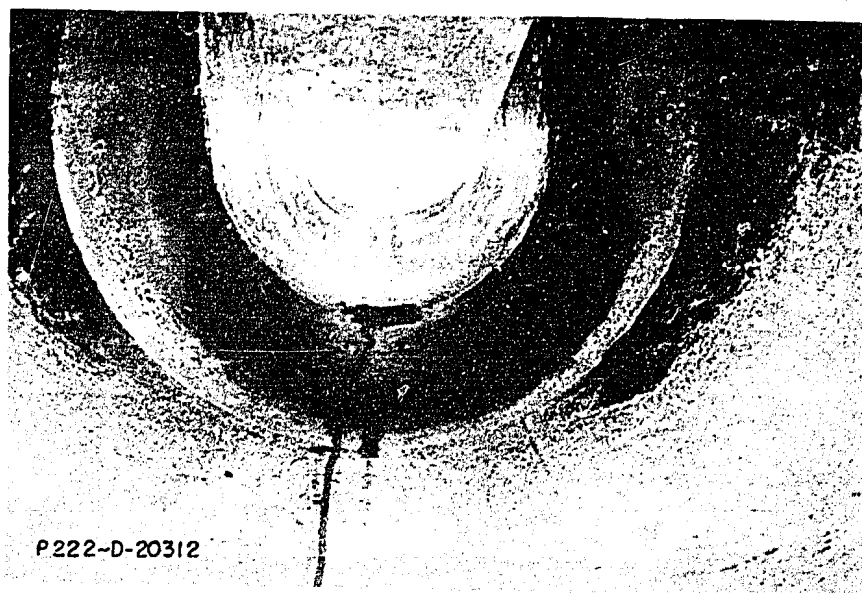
Typical early-stage cavitation-erosion in walls of concrete exit trough downstream from liner cone--Grand Coulee Dam Outlet.
